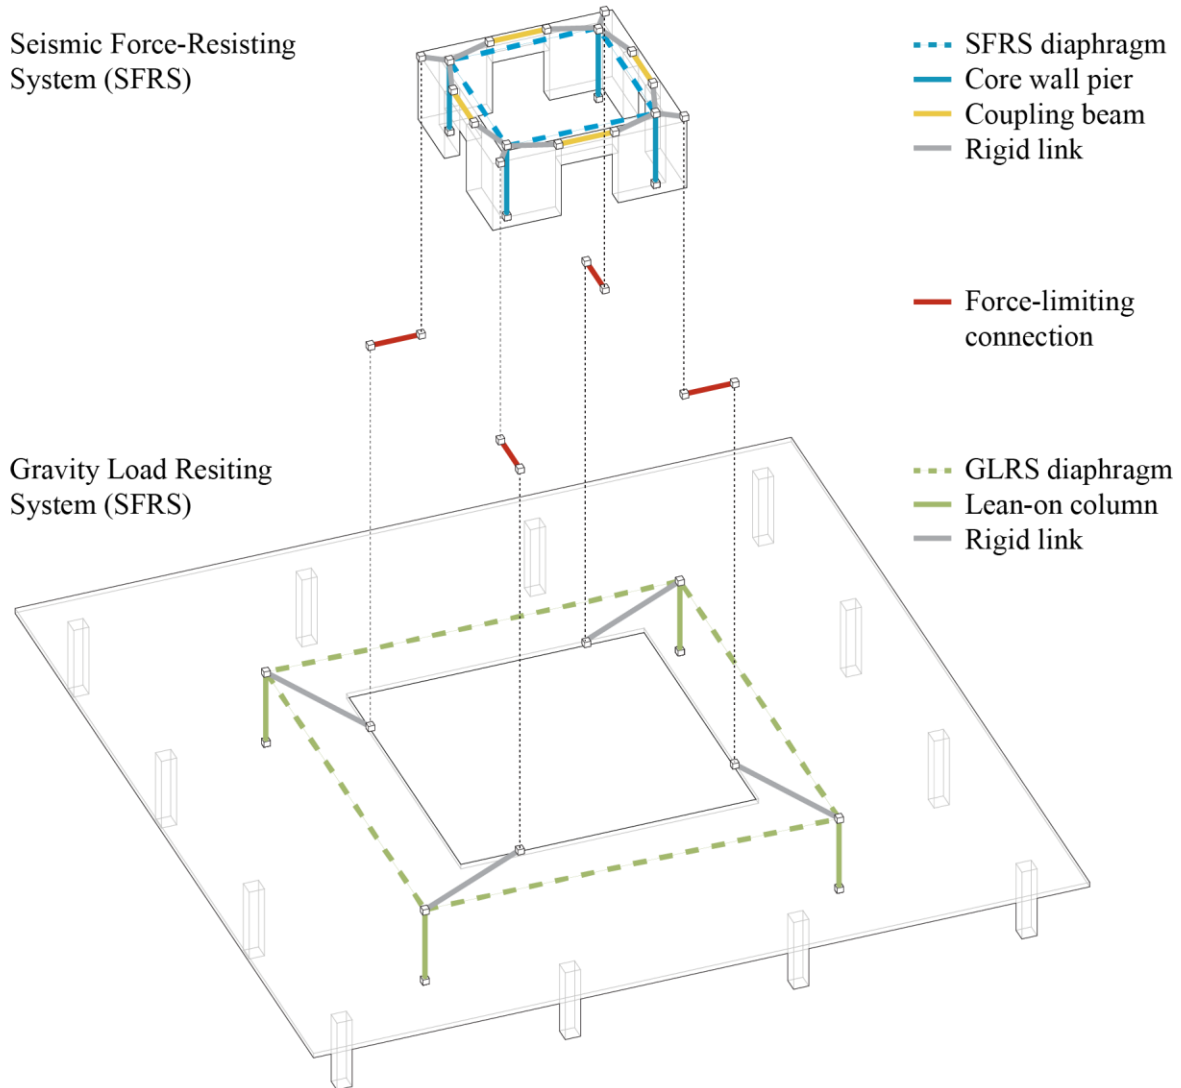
Force-limiting connections connecting the SFRS and GLRS diaphragms
